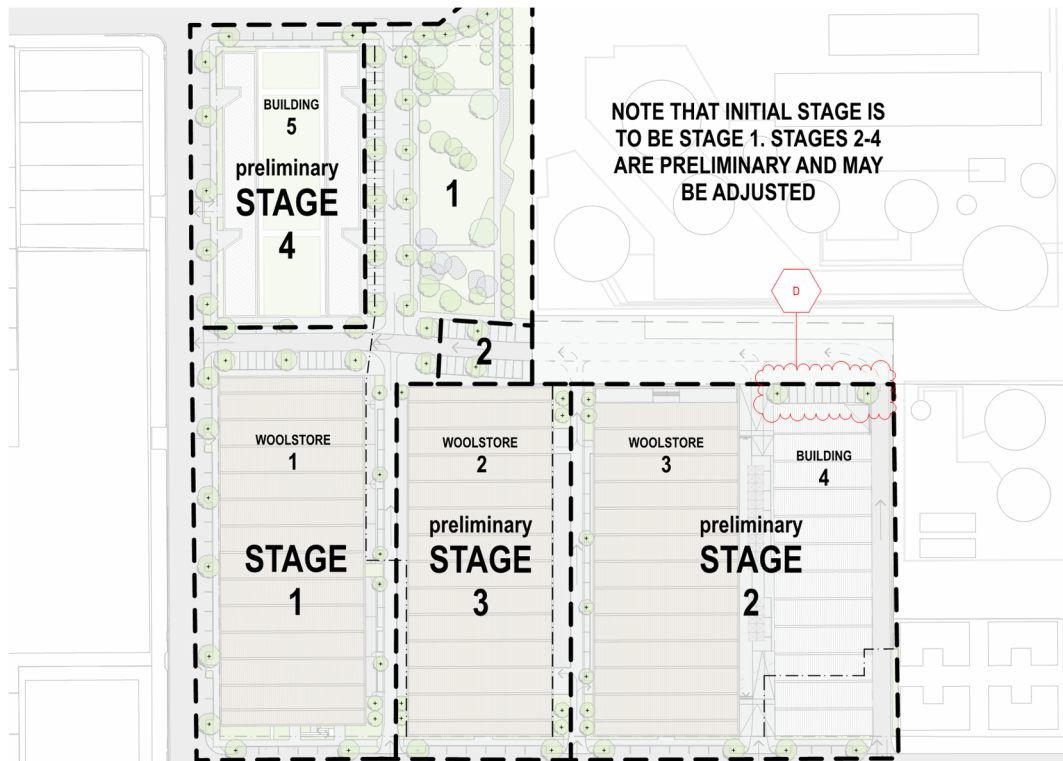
Project Staging Plan (Source: Wickham Woolstores DA Master Plan Report, prepared by Tonkin Zulaikha Greer, Fairweather & City Plan Services)
